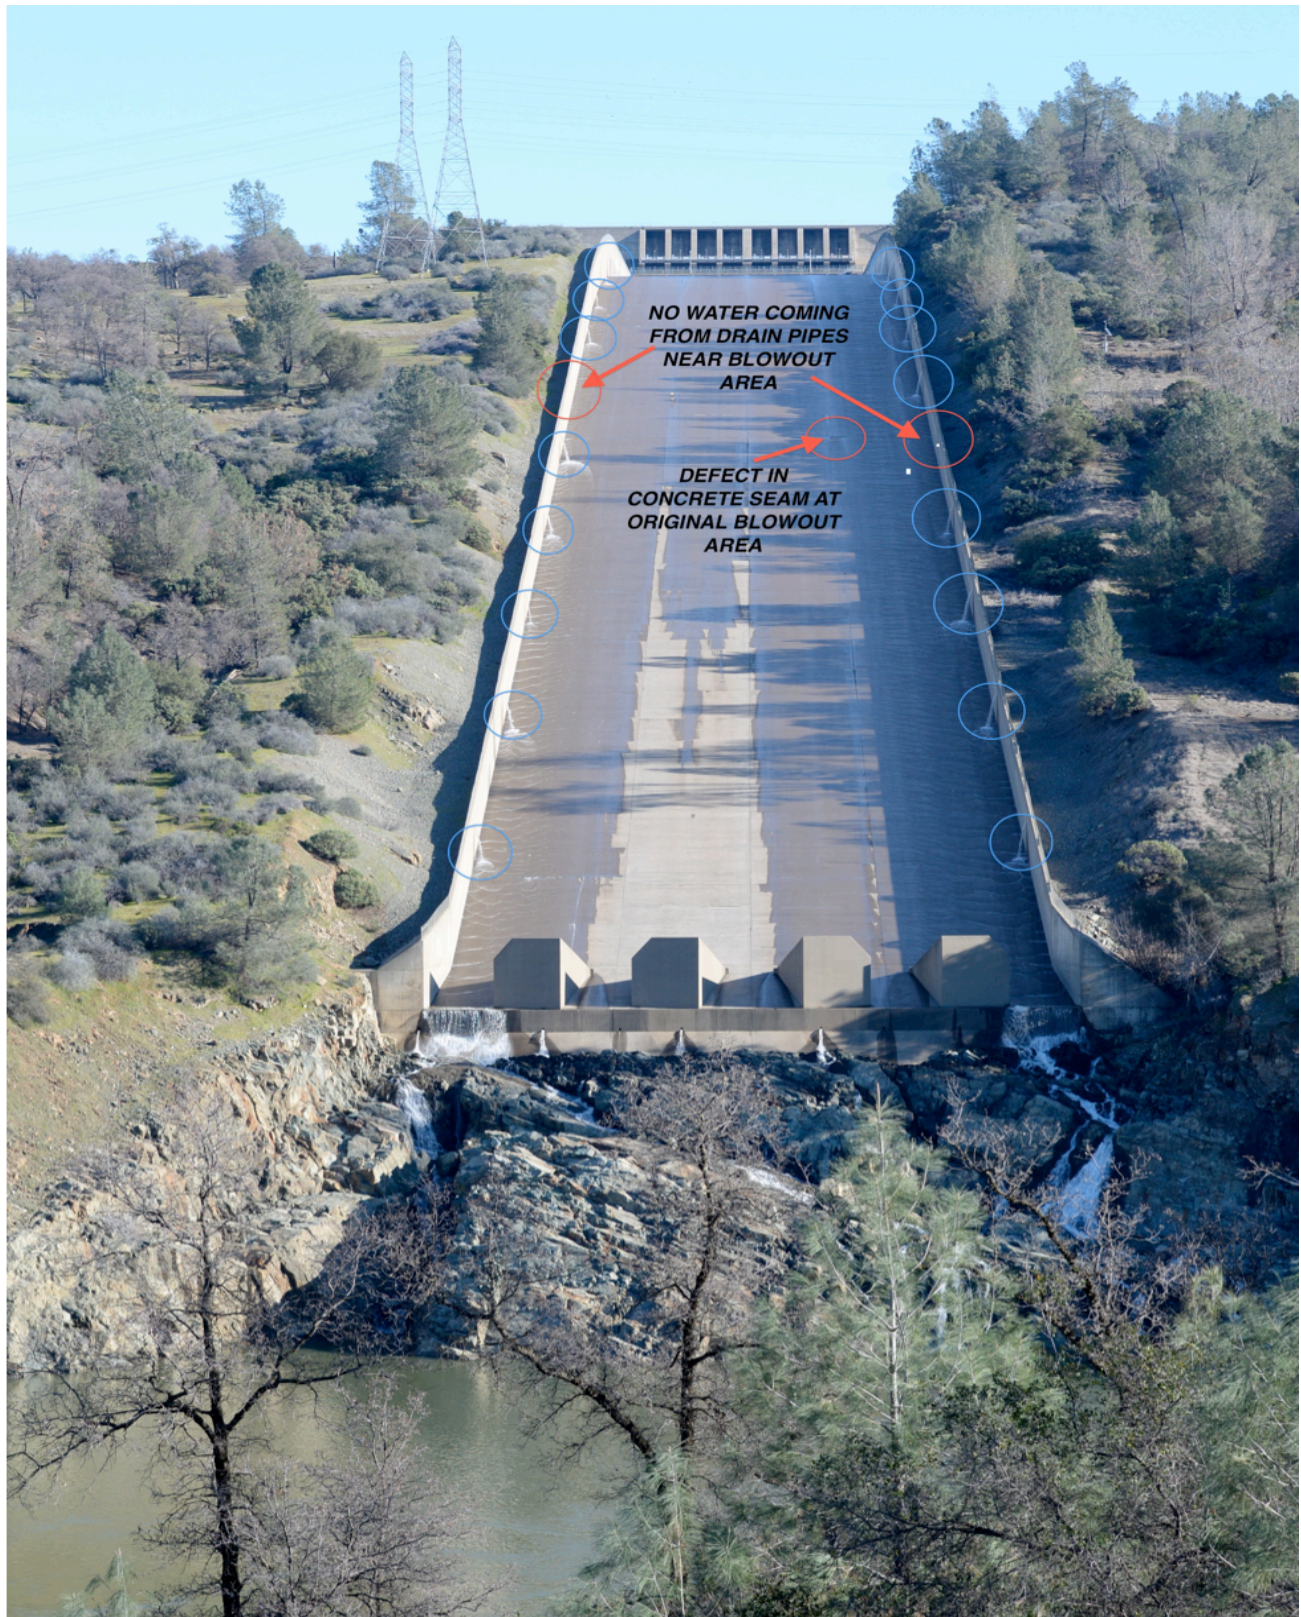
January 27, 2017 Pre-blowout failure photograph of 7.9 foot by 14 inch "hole" in the concrete slab in Oroville Spillway (circled). Note the non-functioning sidewall drains (circled).
